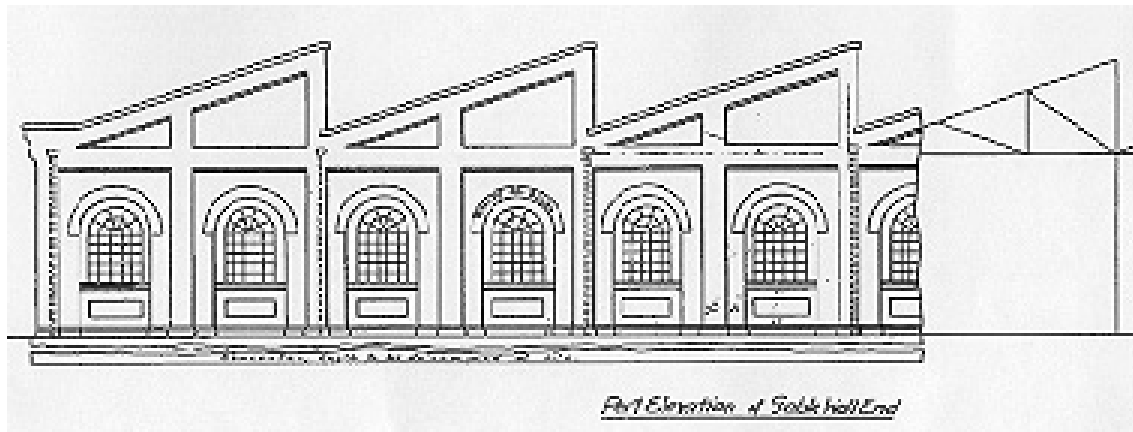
Part elevation of the Carriage Shop Extension dated 1901. Source: SRA Plan Room Drawing 875/15 162.
